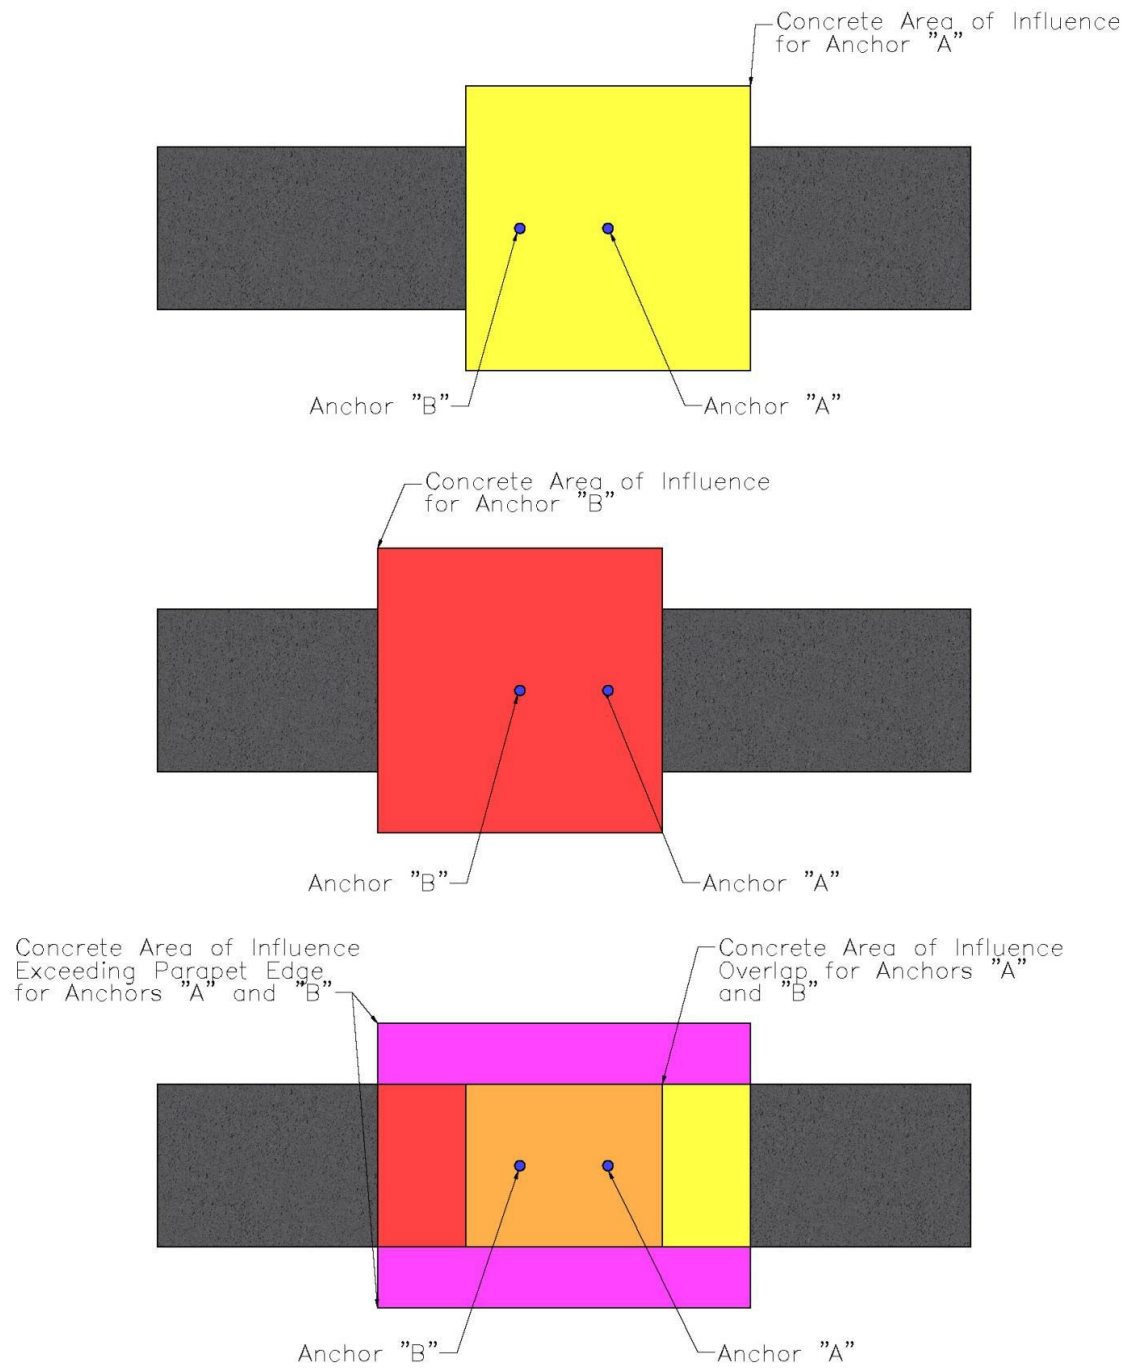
Concrete Area of Influence for Two Adjacent Anchors on Concrete Parapet [42]
